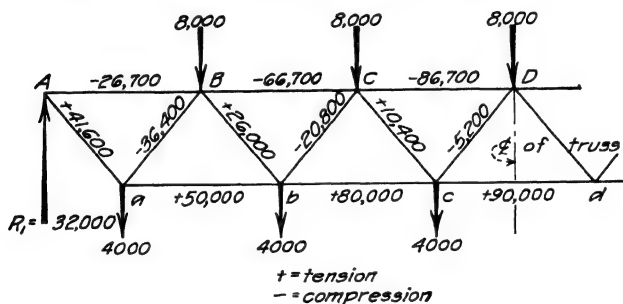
Dead load stresses, deck Warren truss dead load divided between top and bottom chord joints.
